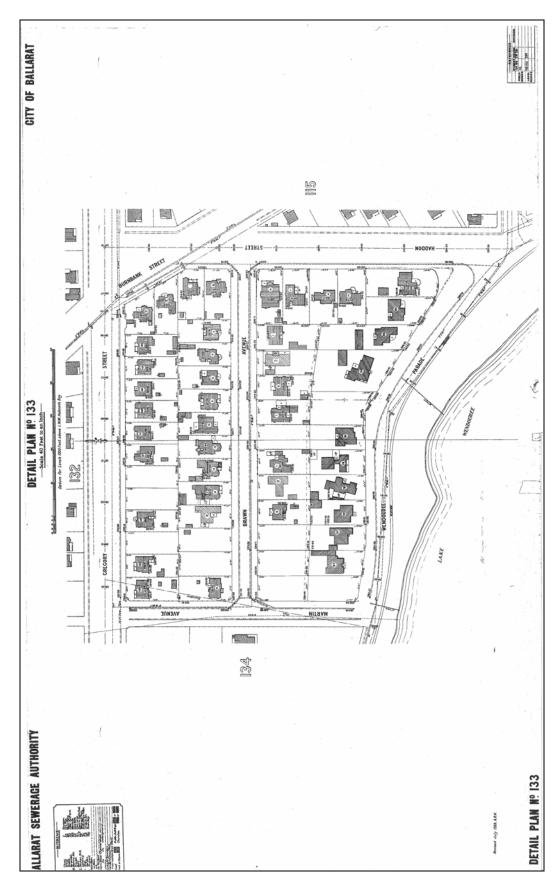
Ballarat Sewerage Authority Plan, 1939. Source: Planning Department, City of Ballarat.
